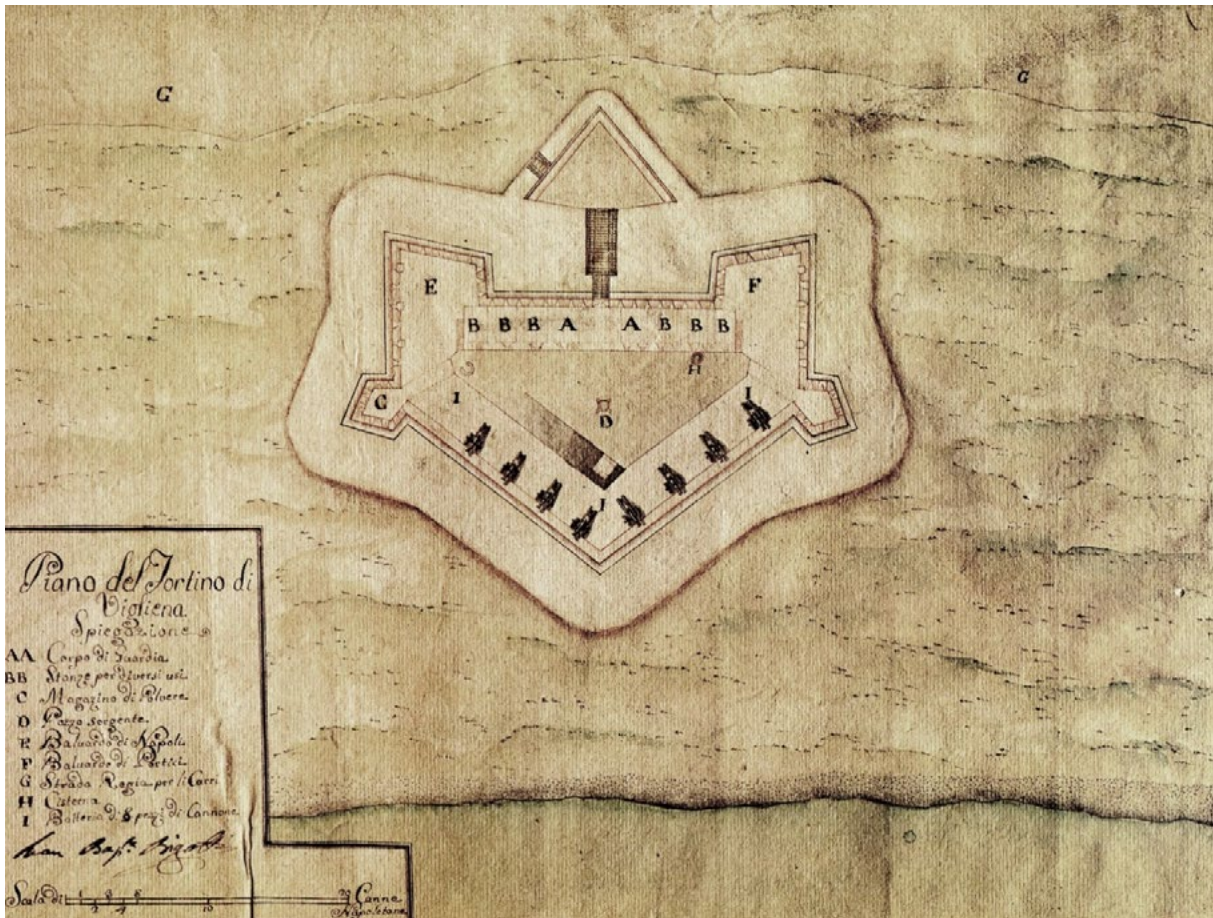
Plan of the Forte di Vigliena, Juan Baptista Bigotti, (State Archives, sala Plant, envelope 22, n. 3)
